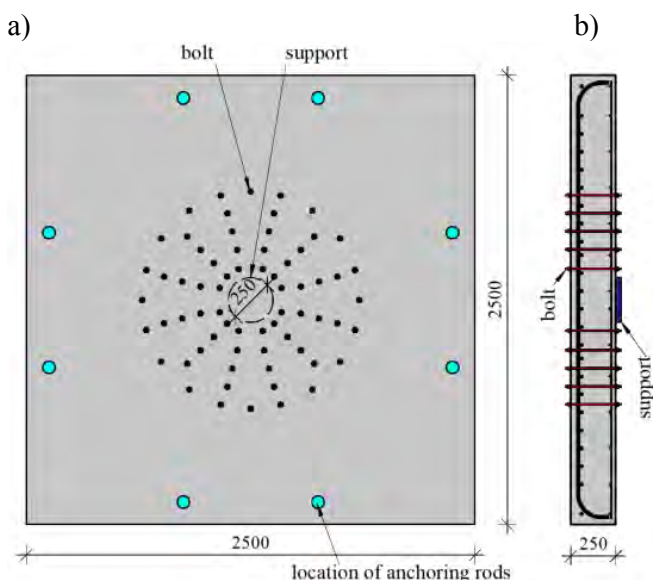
The specimen with shear reinforcement a) top view and b) section.
